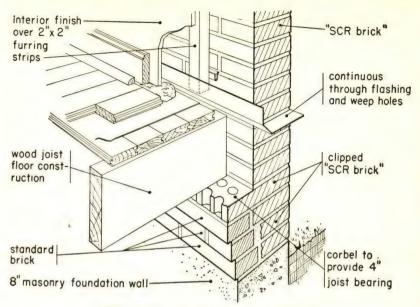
Floor Joists Supported on Corbeled Wall Courtesy of Structural Clay Products Institute
